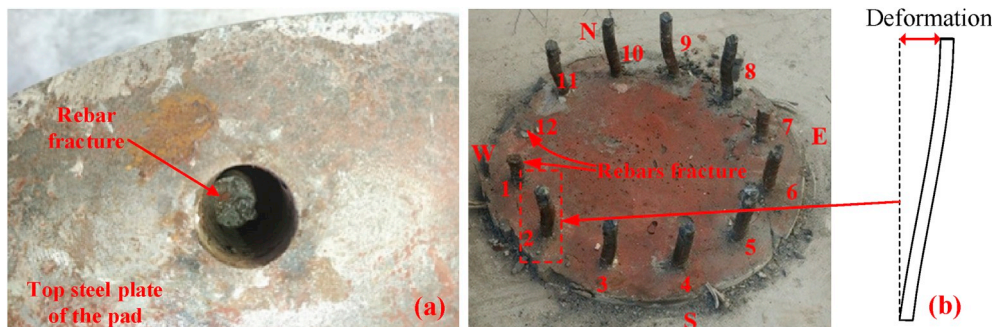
Unbonded rebars in GCP-S specimen (a) Steel rebar fractured; (b) shear deformation of rebar.
